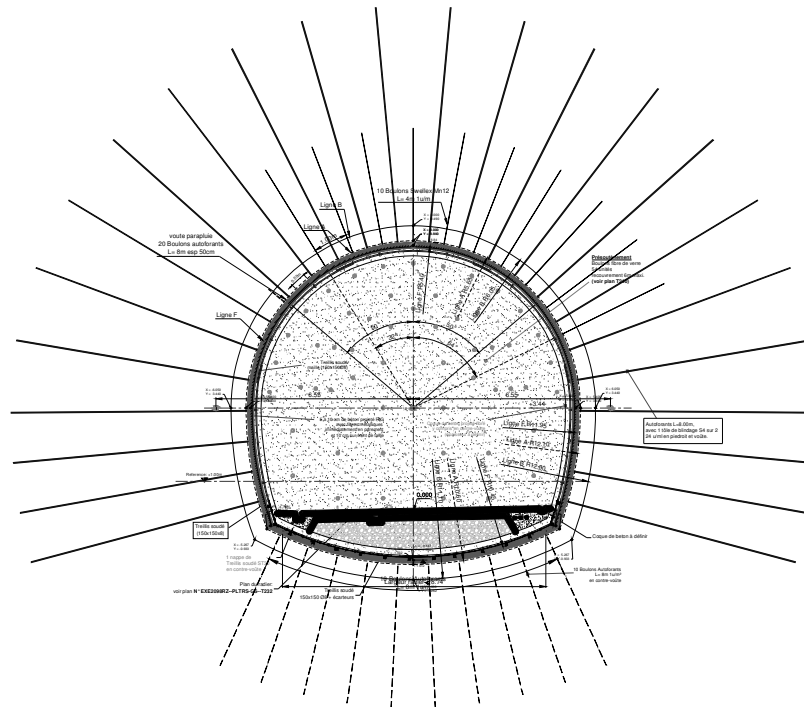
Tunnel cross section (P7.3) showing the excavation-support system adopted between chainage 1267 and 1324 m, where large convergences were experienced and re-profiling was required per Figure 1.
